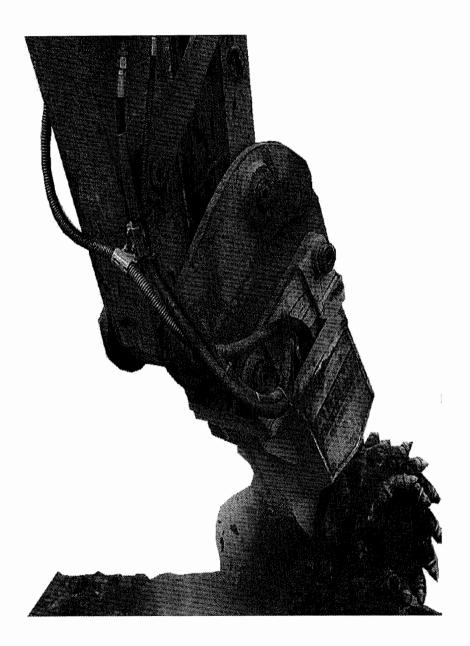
Photograph of Alpine's (One Potential Mechanical Grinding Equipment Company) Hydraulic Rotary Cutter
